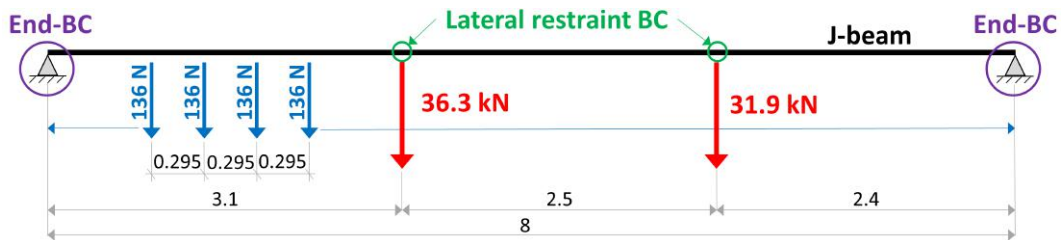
Elevation view of single J-beam model showing loads and boundary conditions
